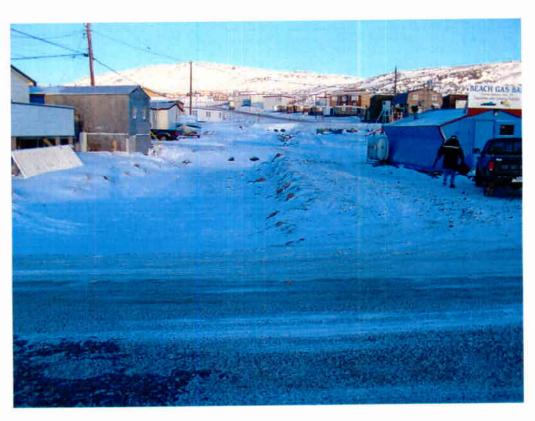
Further downstream, looking northeast along Nanvq Street. Housing is in the damage path.
